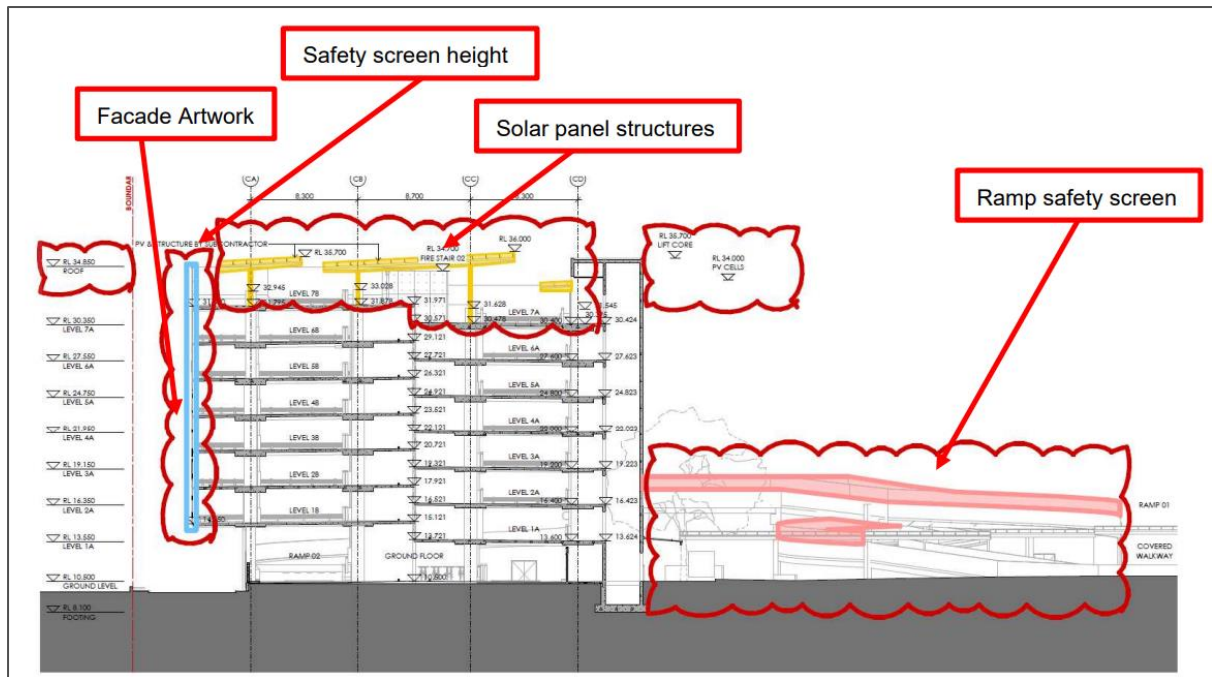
| Proposed north-south section (Source: Applicant's Modification Report 2021)
